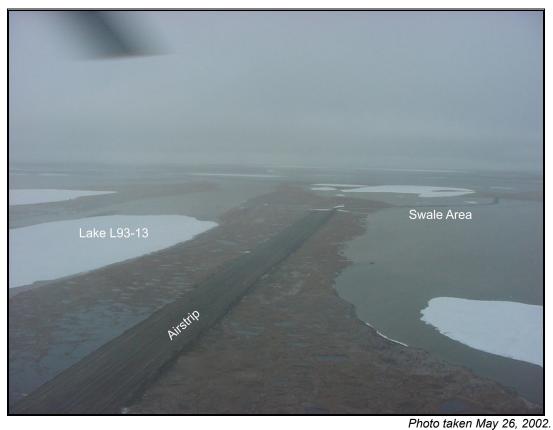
d Flooding conditions at Alpine looking southwest along airstrip.
